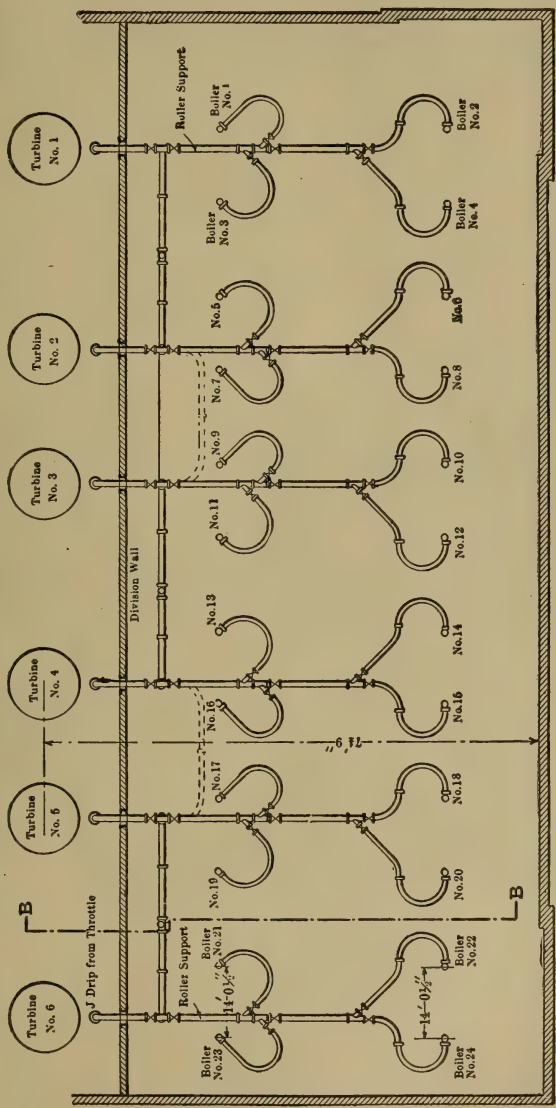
Plan of High-pressure Piping, Yonkers Power House of the New York Central R.R.
